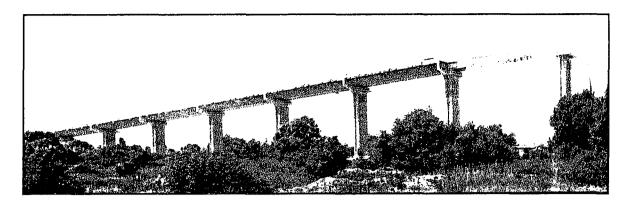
CONCRETE ACCESS SPANS LAUNCHED FROM THE NORTH BANK (Courtesy of AFPC, 1994)
